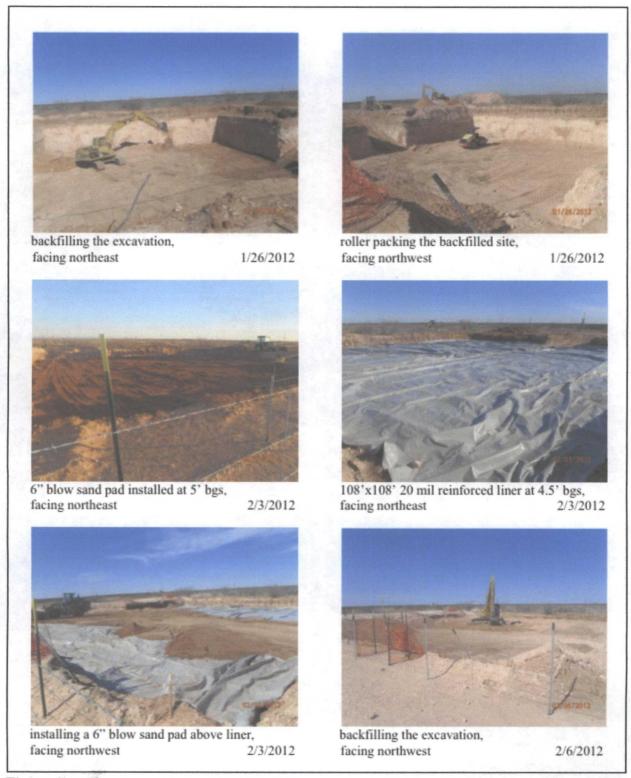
Photographic record of soil excavation and installation of double synthetic liner system.
